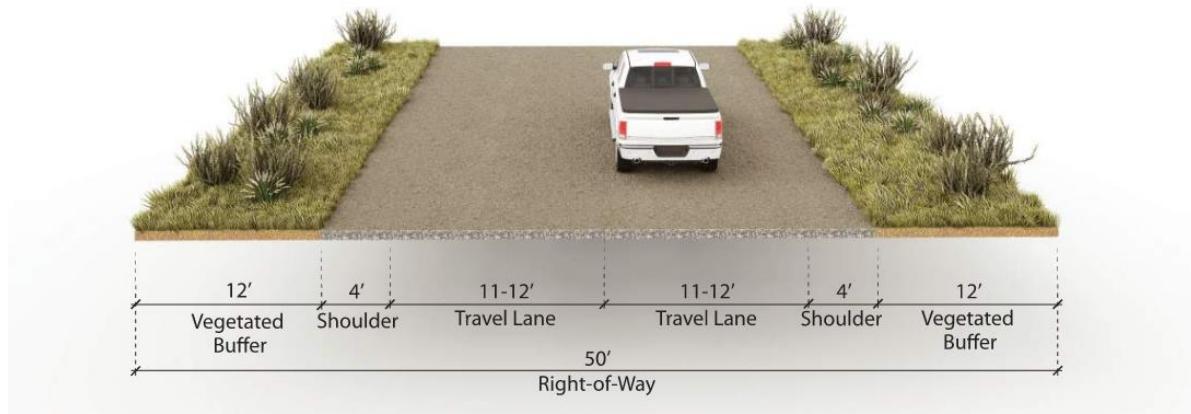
Cross-section for Rural Local StreetFigure 10: Cross-section for Rural Local Street – Gravel Option
